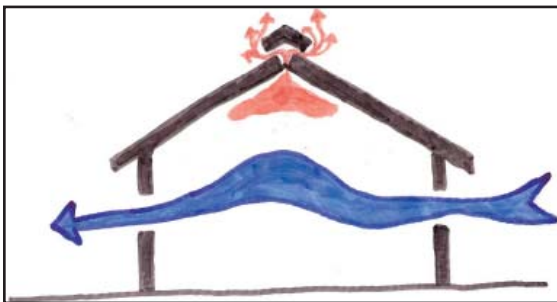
Cross ventilation without drop ceiling and ridge vent. Notice warm air rises further away from occupants.
